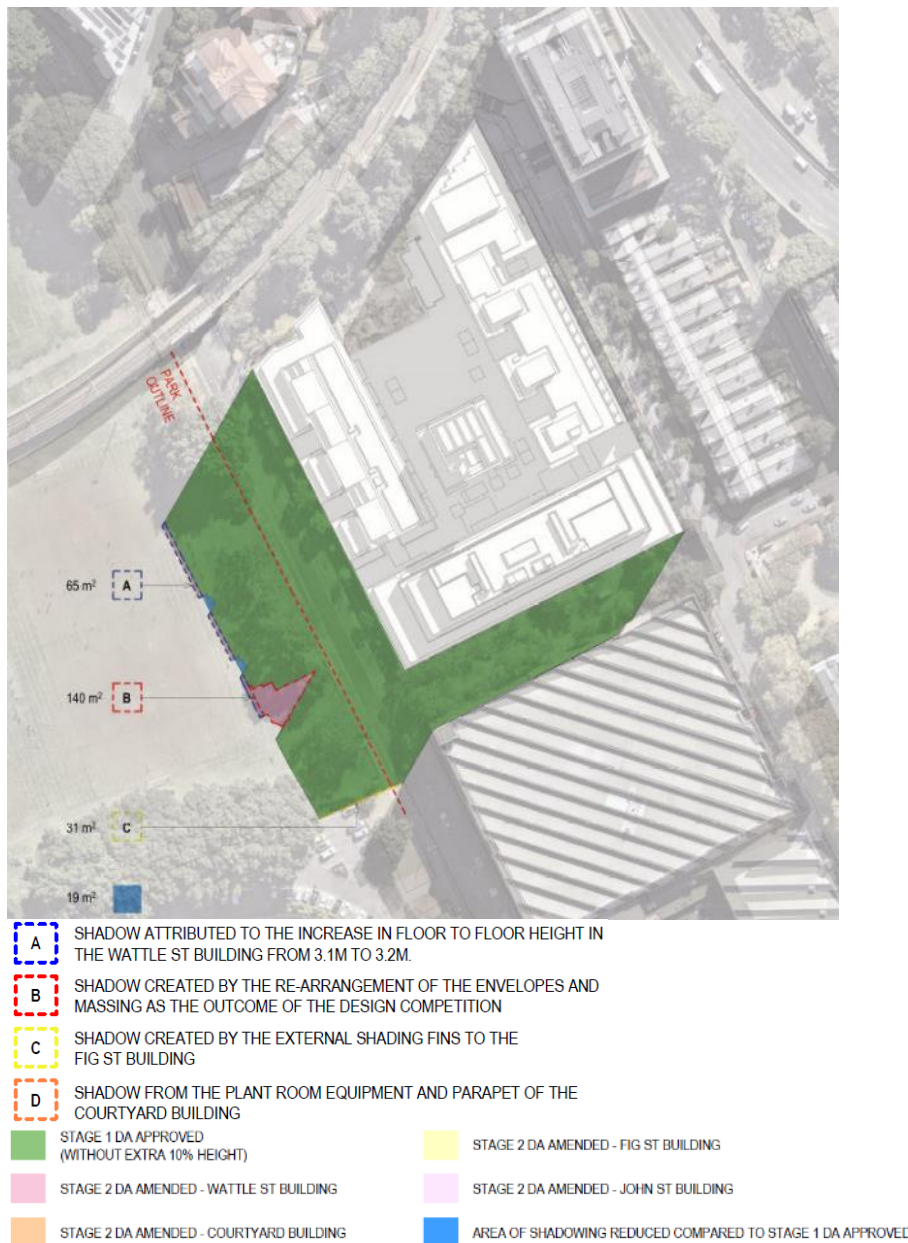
Building D - Wattle Street, Building C - Courtyard and Building E - Fig Street: Shadow diagram at 10am in midwinter
